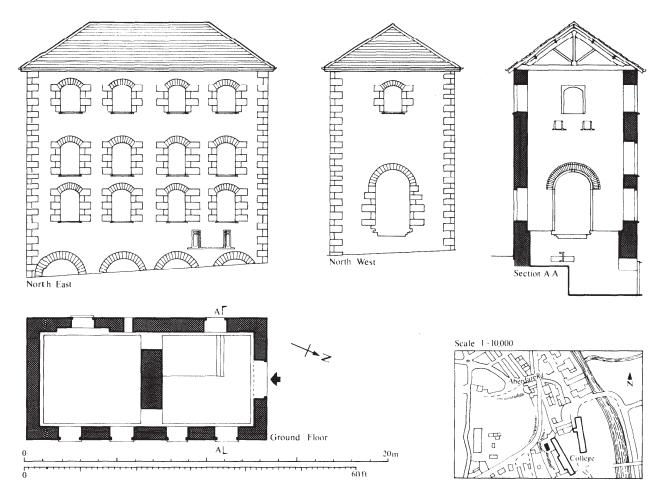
Plan and section of Ynysfach Enginehouse, based on a plan commissioned by the Merthyr Tydfil Heritage Trust from Jones Thomas Associates, Chartered architects, Builth Wells, December 1986. Inset: location plan
